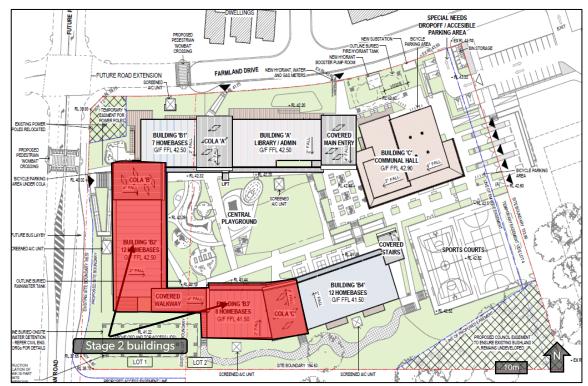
| Site layout with Stage 2 buildings shown in red (Base source: Applicant's SRtS2 2020)
